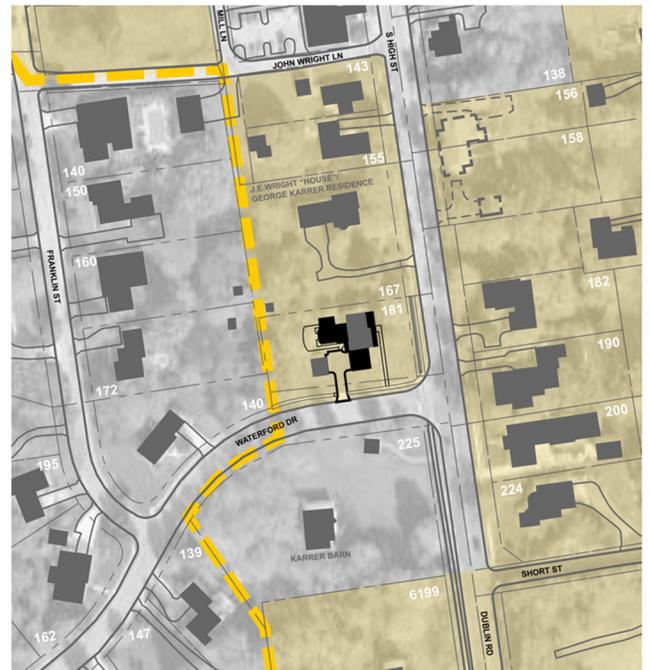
This shows the proposed site plan with the original building portions that remain generally intact as gray, and additions to the original structure as black. Again, this proposed plan requires modification to comply with recommendations.
